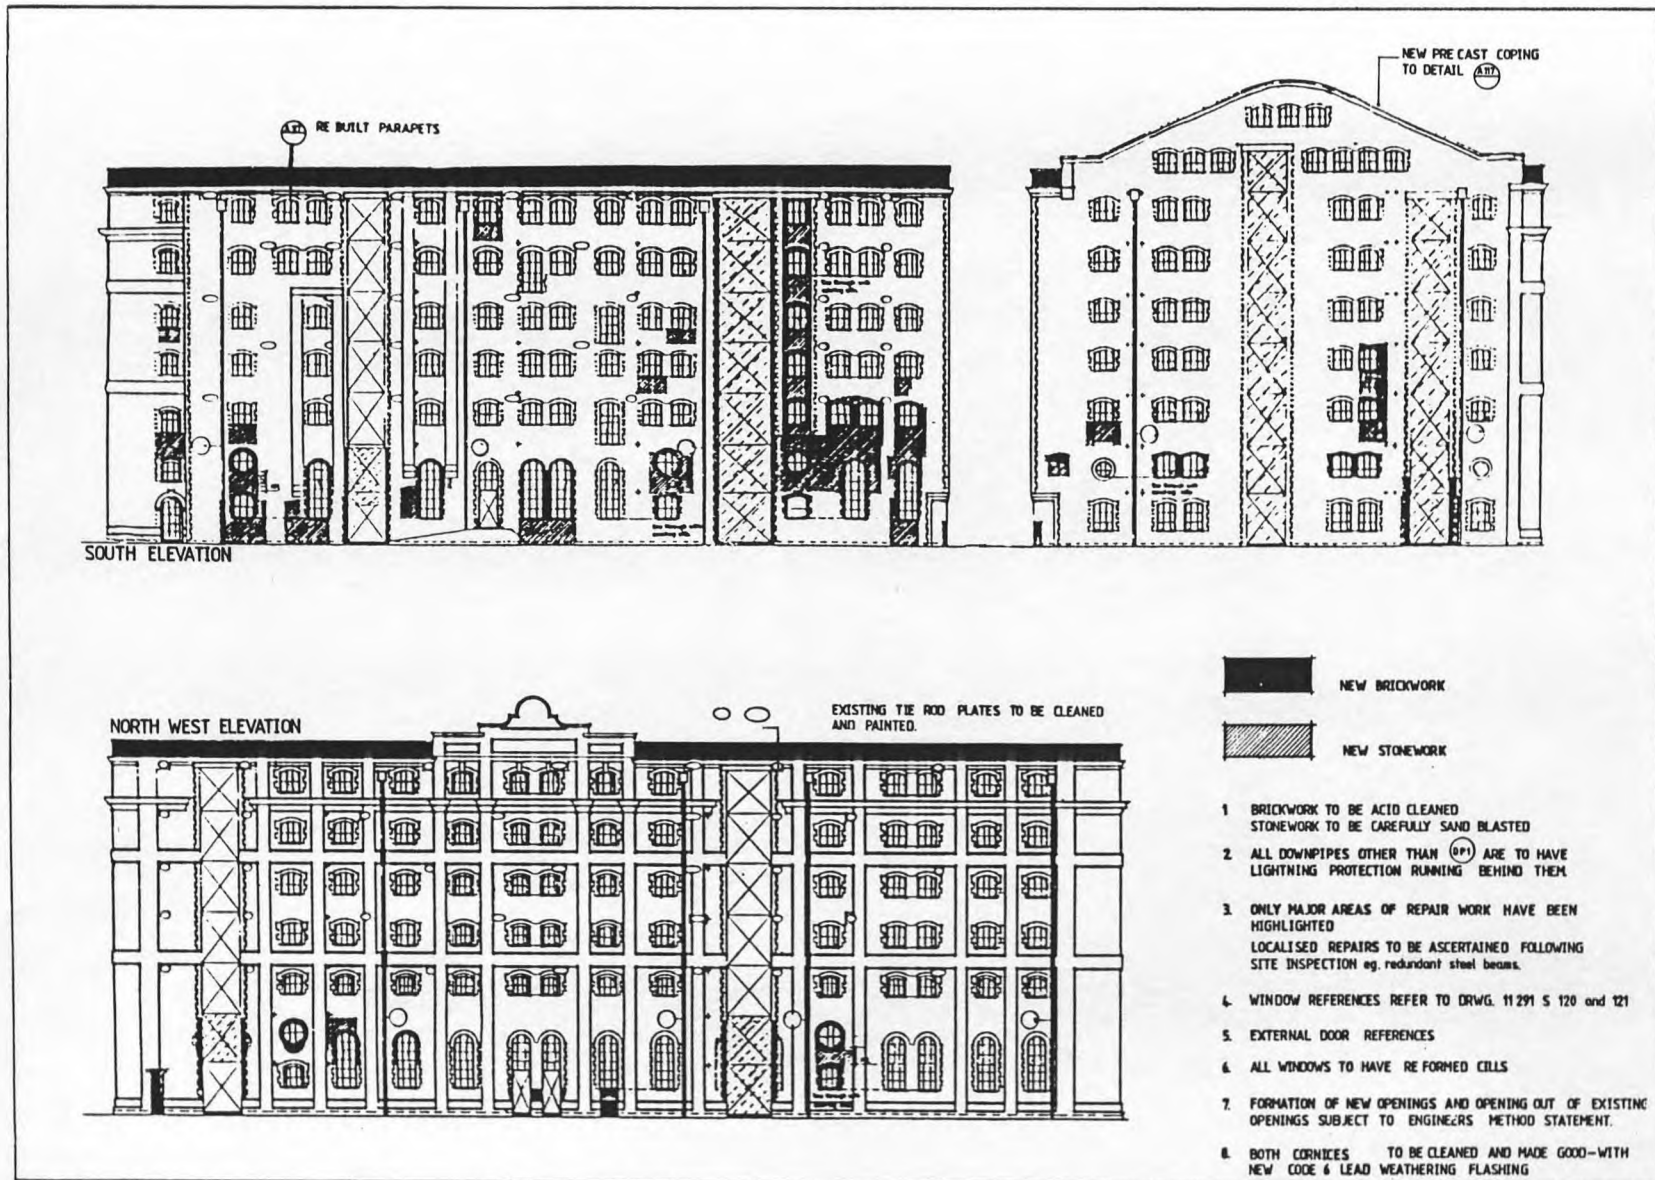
Elevations of the Spillers and Bakers warehouse, Atlantic Wharf, Cardiff, showing architects' proposals for external alterations and cleaning of building (source: adapted from block elevation drawings, provided by the Architectural Practice, n.d.)
